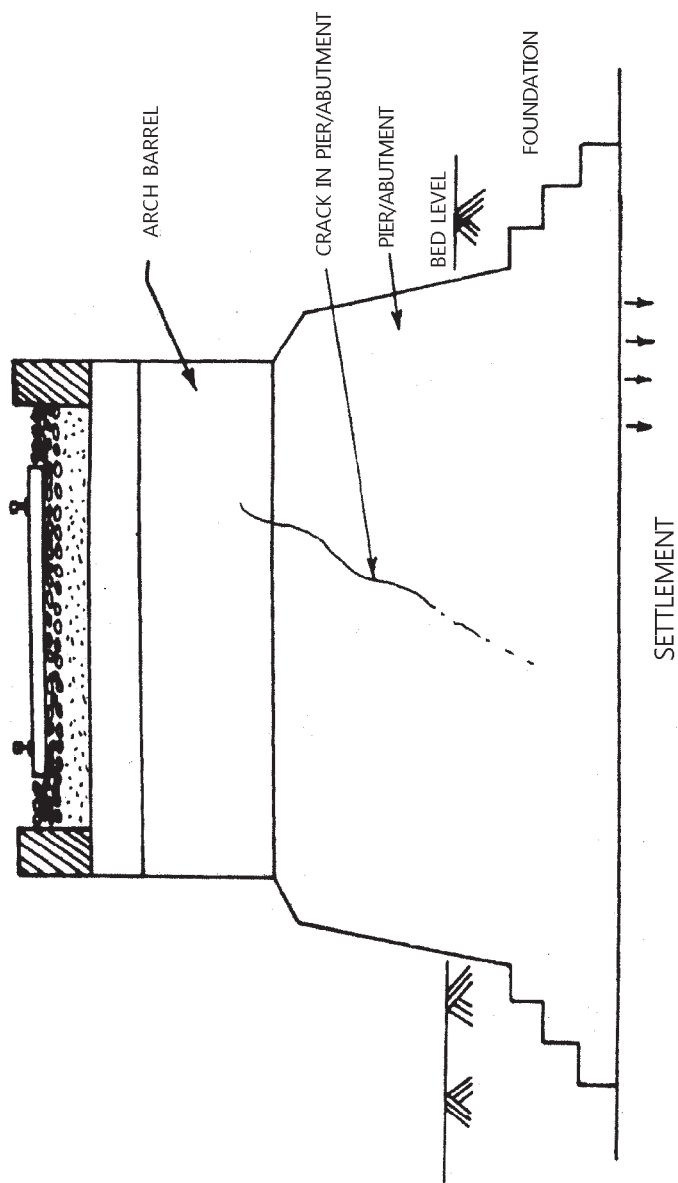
Crack in pier/abutment extending to arch barrel
